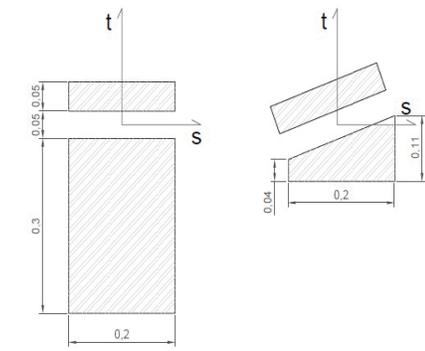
Bottom (left) and Top (right) sections of the tilted edge beams (measures in meters)
